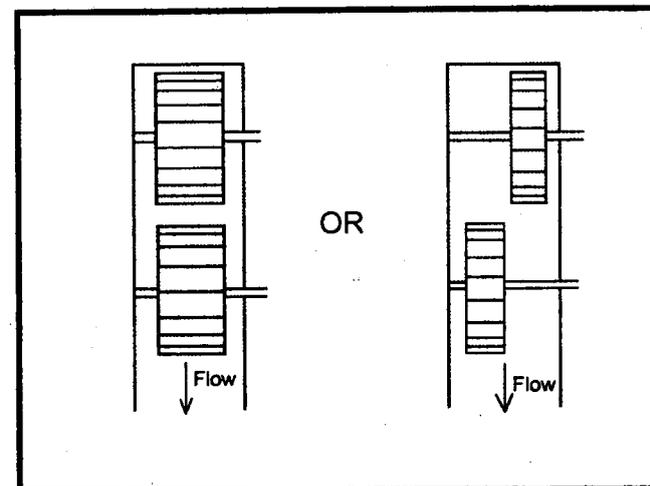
Plan views of the wheelpit showing two possible configuration of waterwheels before the rebuilding in 1765 (assuming the same thickness of dam wall as at present).
